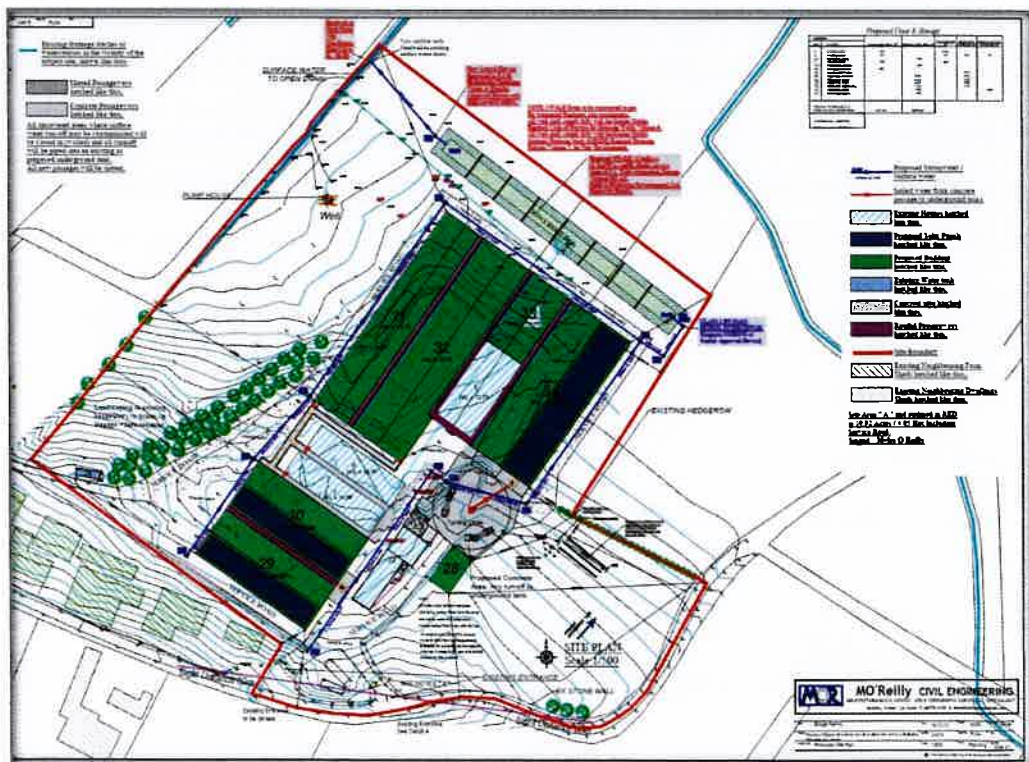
Proposed Site Plan (M O'Reilly Civil Engineering)
